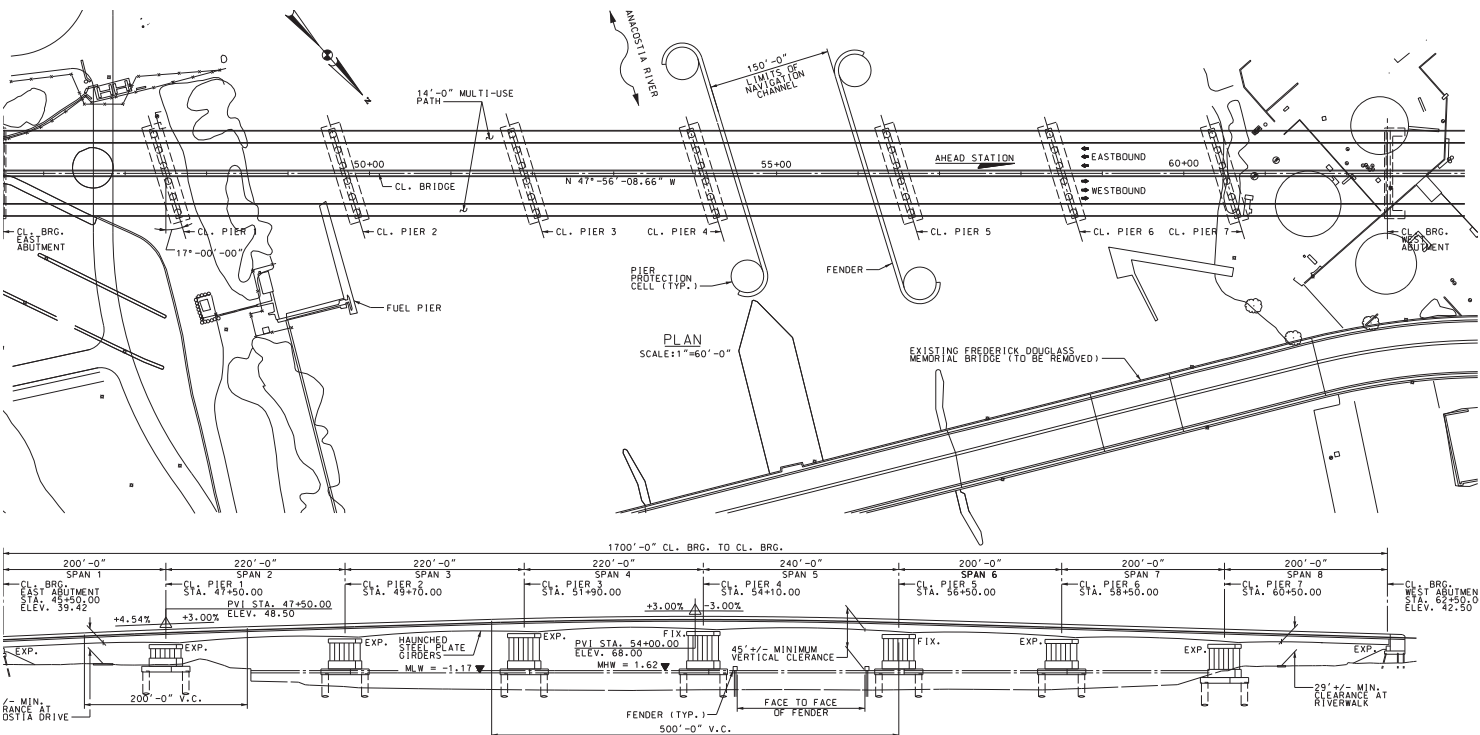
Bridge Alternative 2 - Plan and Elevation
